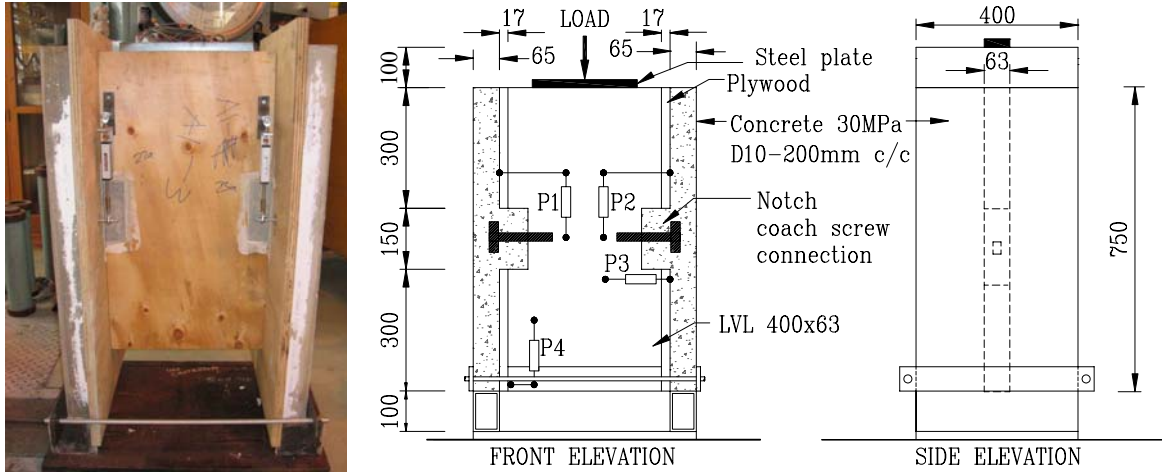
Symmetrical push-out test set-up (dimensions in mm)
